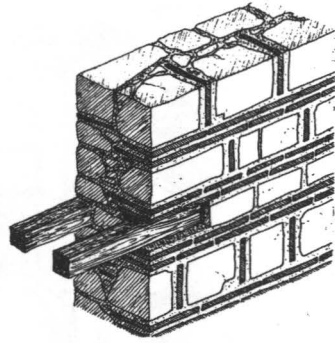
Diagram showing the positions of reinforcing beams in a wall (Velenis)
